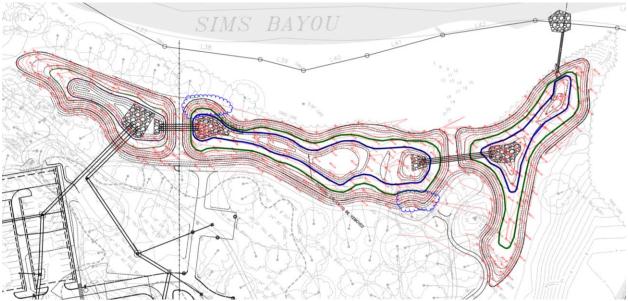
Final as built grading plan for Stormwater Wetlands depicting culverts, stone rip-rap, outfall, and parking lot inflow to first basin.
